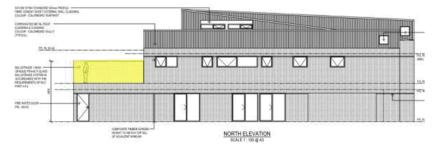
north elevation of the proposed deck at 324 Davey Street, South Hobart (highlighted in yellow).
